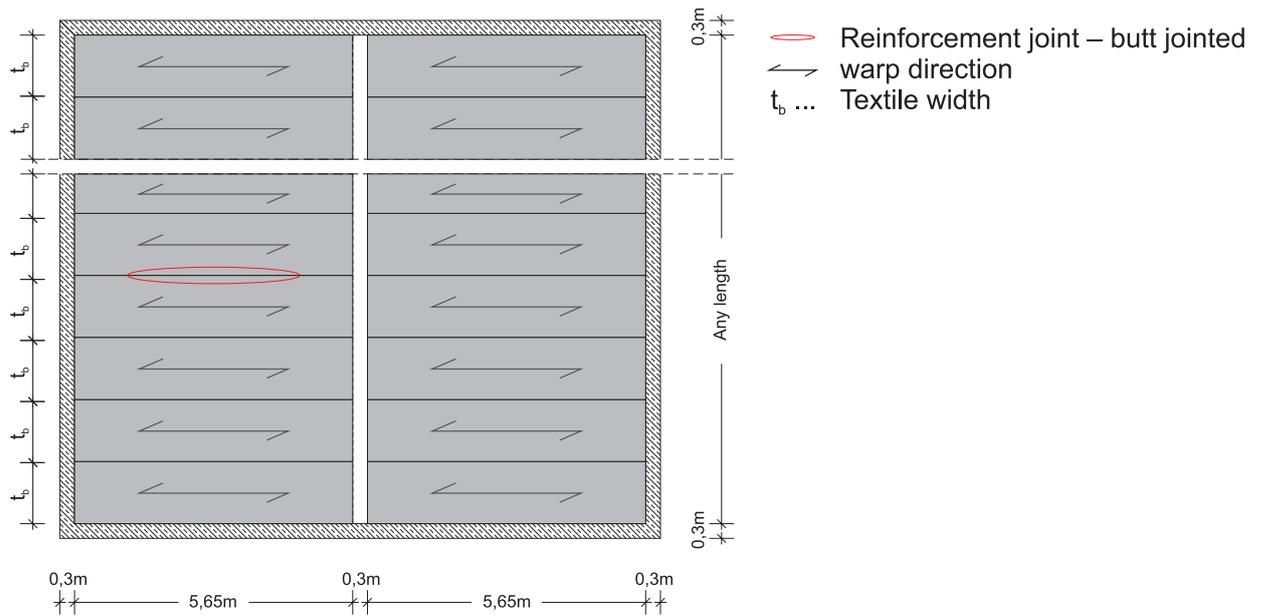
Section U-U, bottom view of ceiling slab showing installation plan for strengthening layer 1 (see also figure 4.7)
